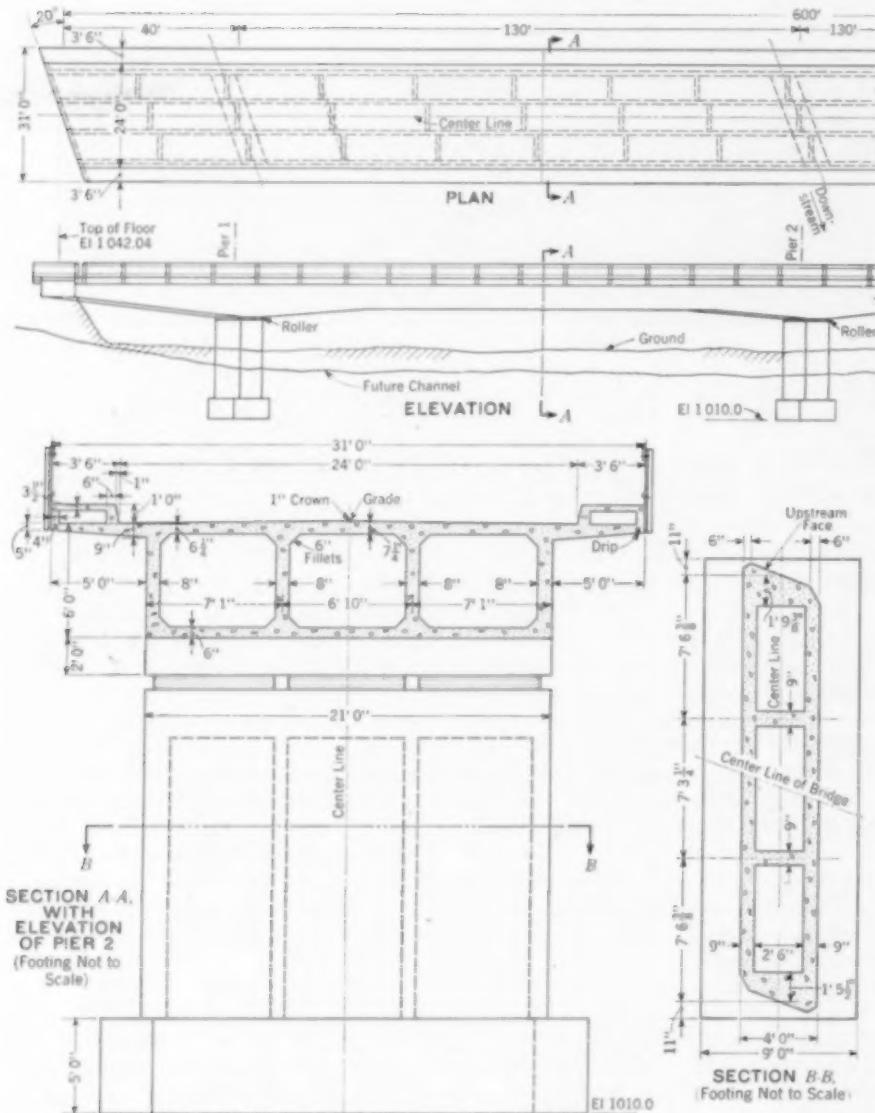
PLAN, ELEVATION, AND SECTIONS, END SPAN
